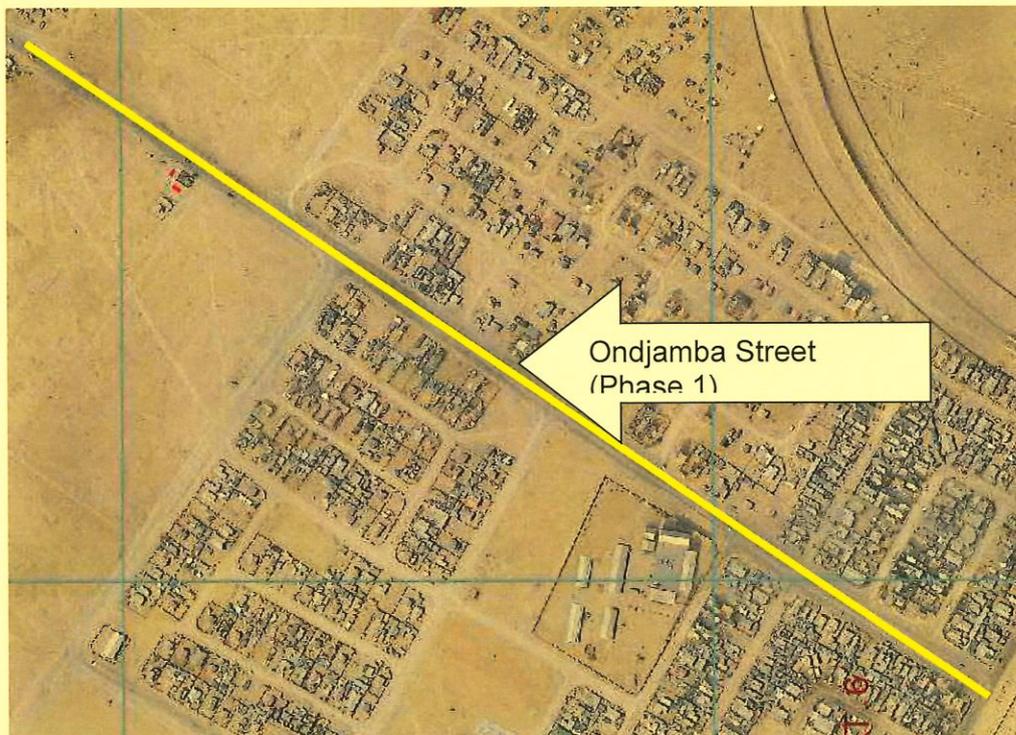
Locality Plan of Ondjamba Street (Phase 1)
